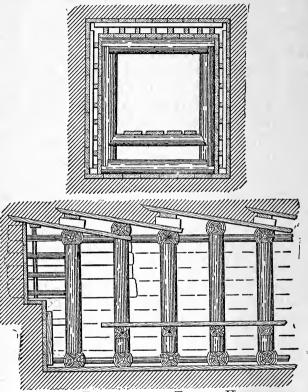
TIMBERING FOR TUNNEL HEADING.
